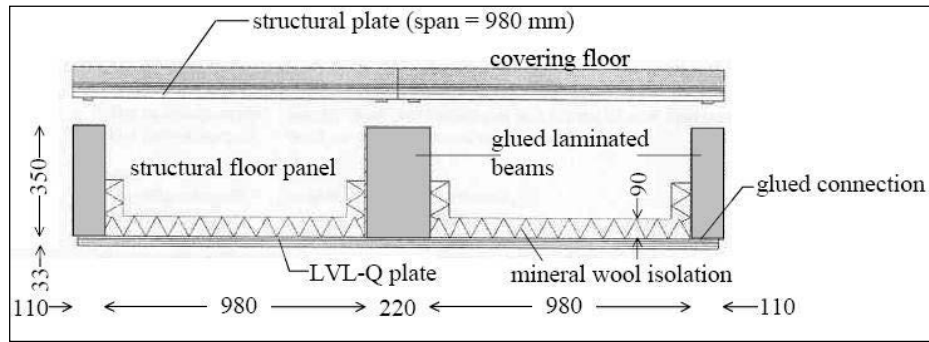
Cross section of the floor elements (André Jorissen 2006)
